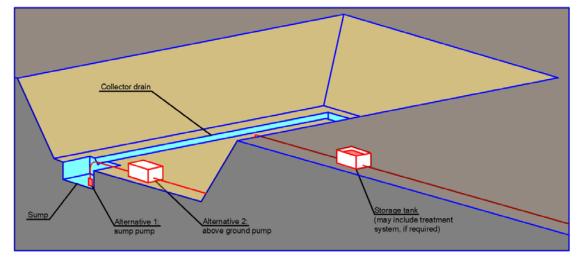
Hypothetical layout of a Sump and Pump seepage collection system
